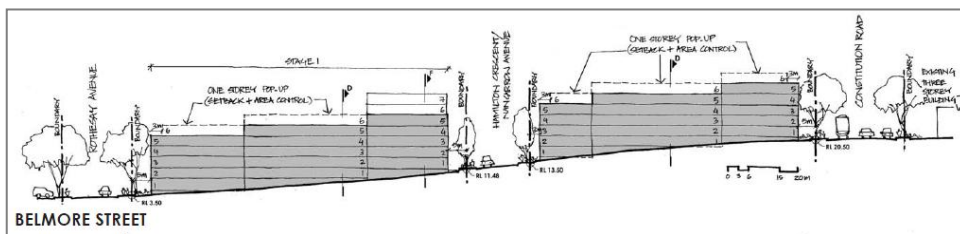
Extract from the EA demonstrating the built form pattern of the proposed terrace design principle which presents as a 5 storey building element at the high storey of the site as viewed from Constitution Road with a 6 storey corner element (right).
